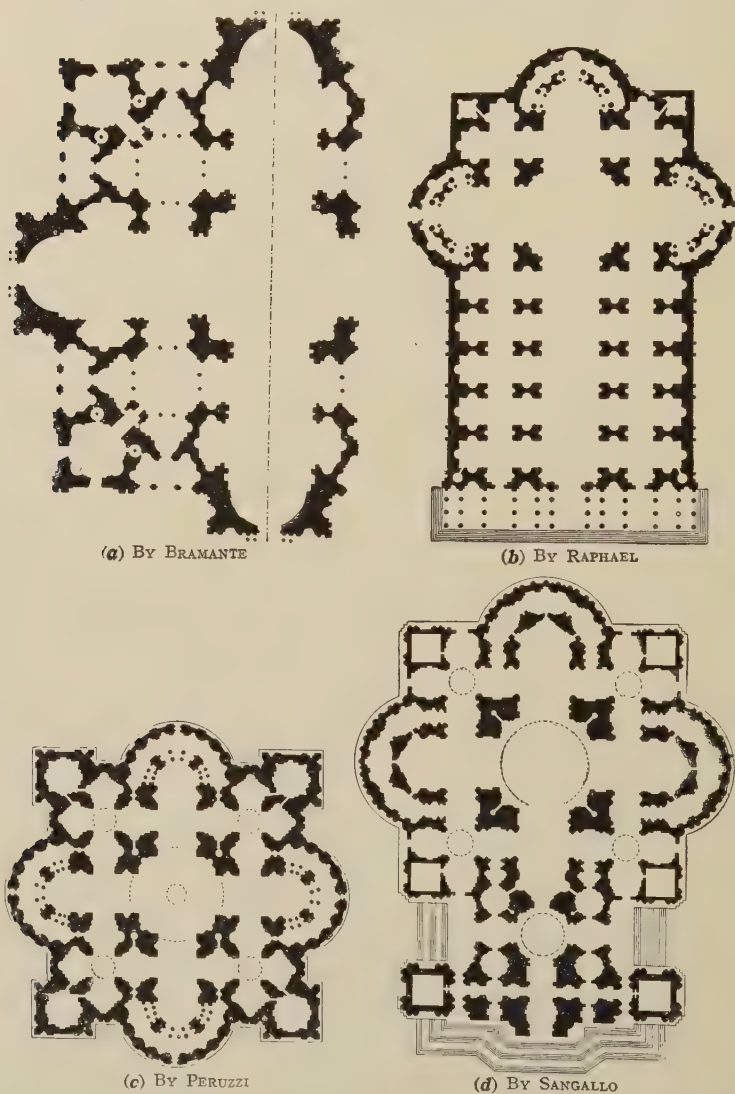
PROPOSED PLANS OF ST. PETER'S, ROME
